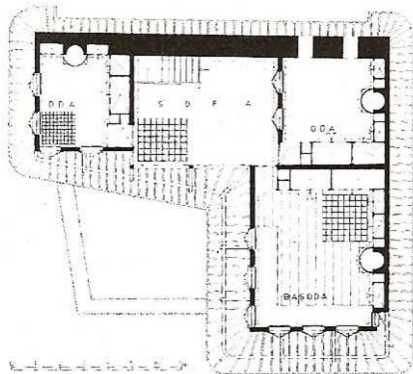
The plans of the ground and first floor of a house in Bursa.
